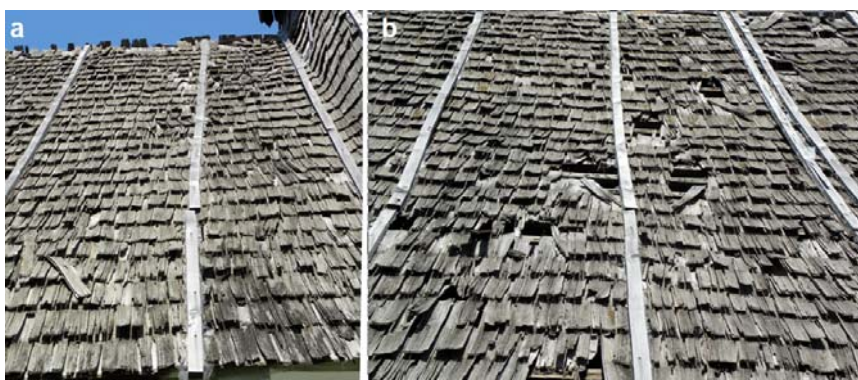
Damages at shingle roof from 2011: a - North side, b - South side
